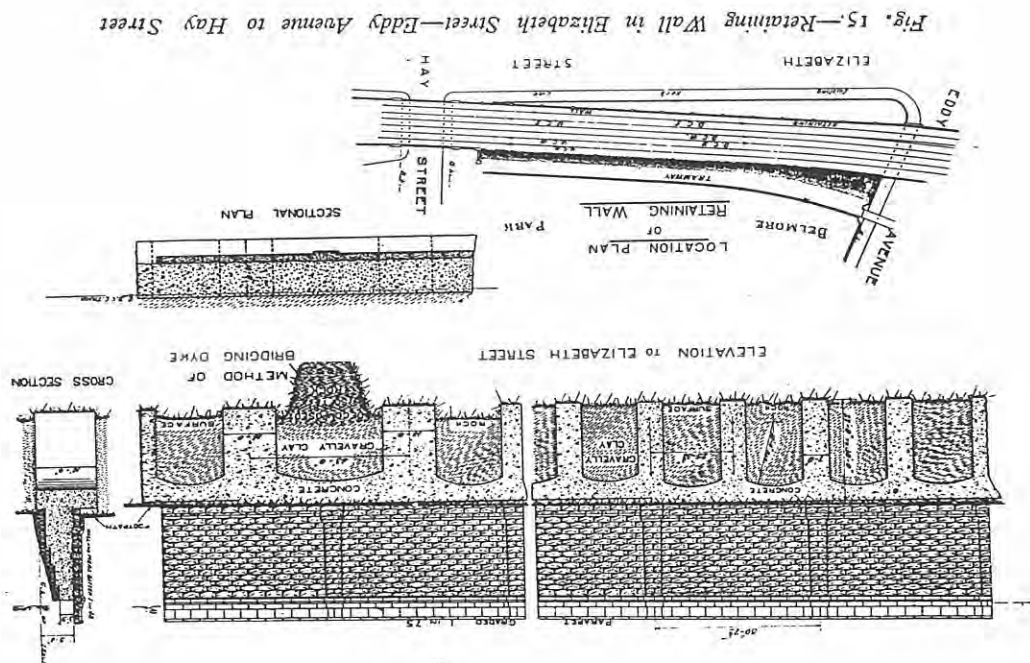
Retaining Wall in Elizabeth Street—Eddy Avenue to Hay Street
